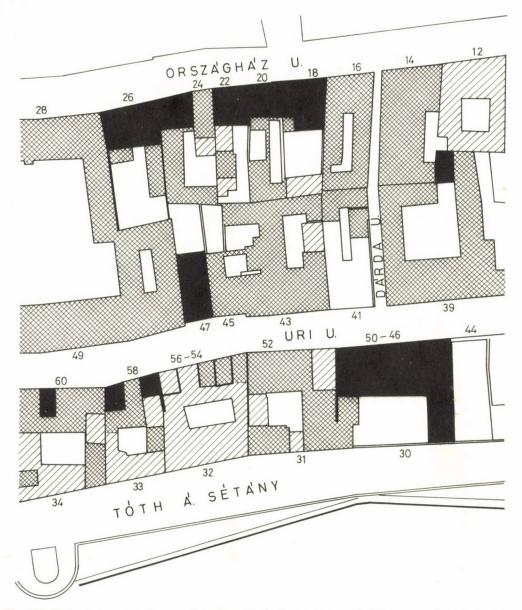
Dating layout plan of a part of the Buda Castle district. Hatched buildings are mediaeval, shaded ones are baroque, empty ones are classicist
